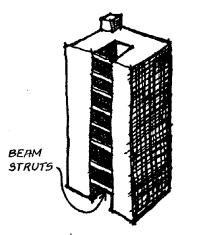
Early solution for U-plan weakness in resisting wind, Park Row Building, New York.
